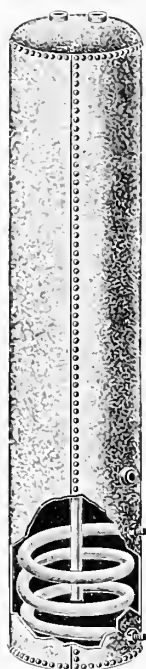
GALVANIZED IRON BOILER, WITH COIL.
